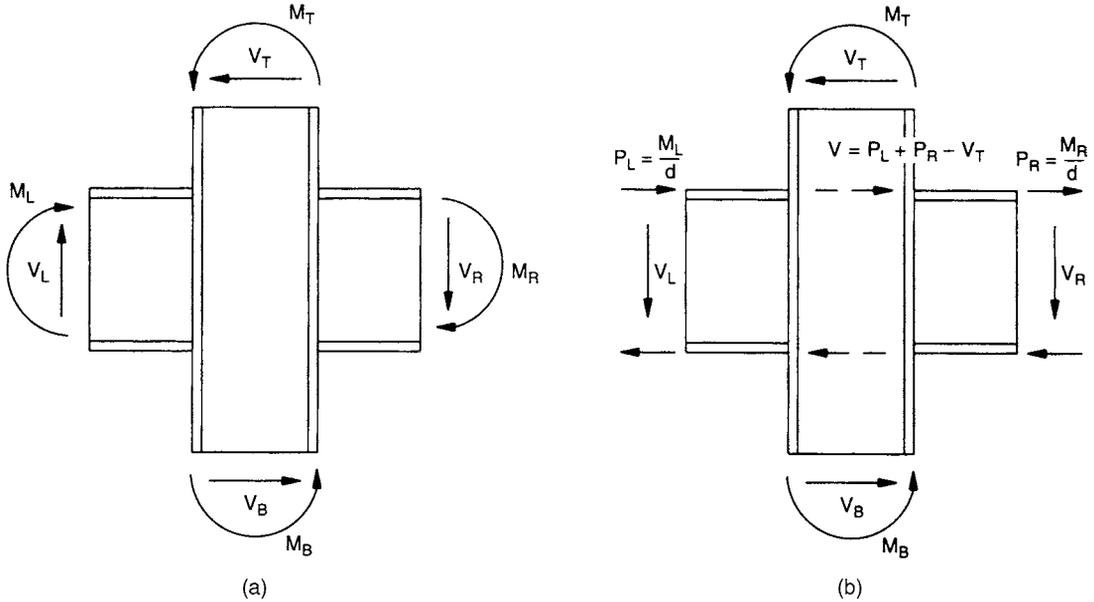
Forces acting on a column and beam in the panel zone in a typical moment-resisting connection during seismic loading. Forces in (a) are equivalent to those in (b).
